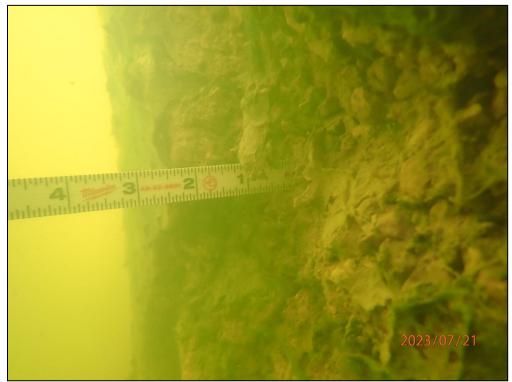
Pier 9 Spall in Southeast Quadrant
